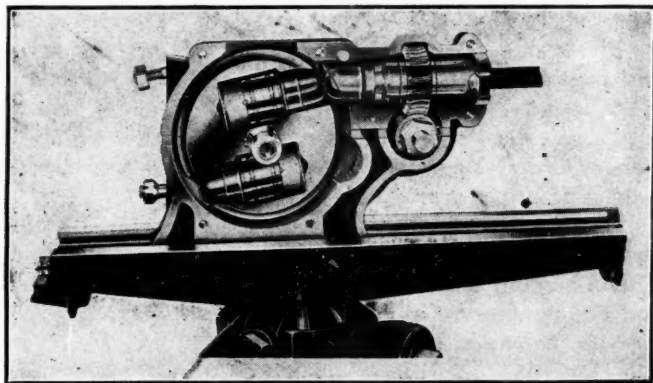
MOTOR-DRIVEN PERCUSSIVE ROCK DRILL
